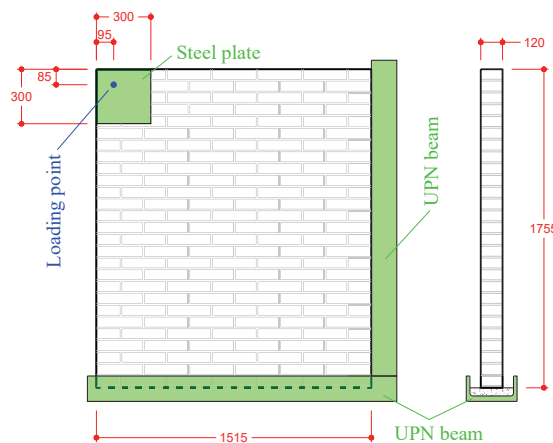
Geometry of the masonry wall subjected to out-of-plane loading (dimensions in millimeters)
